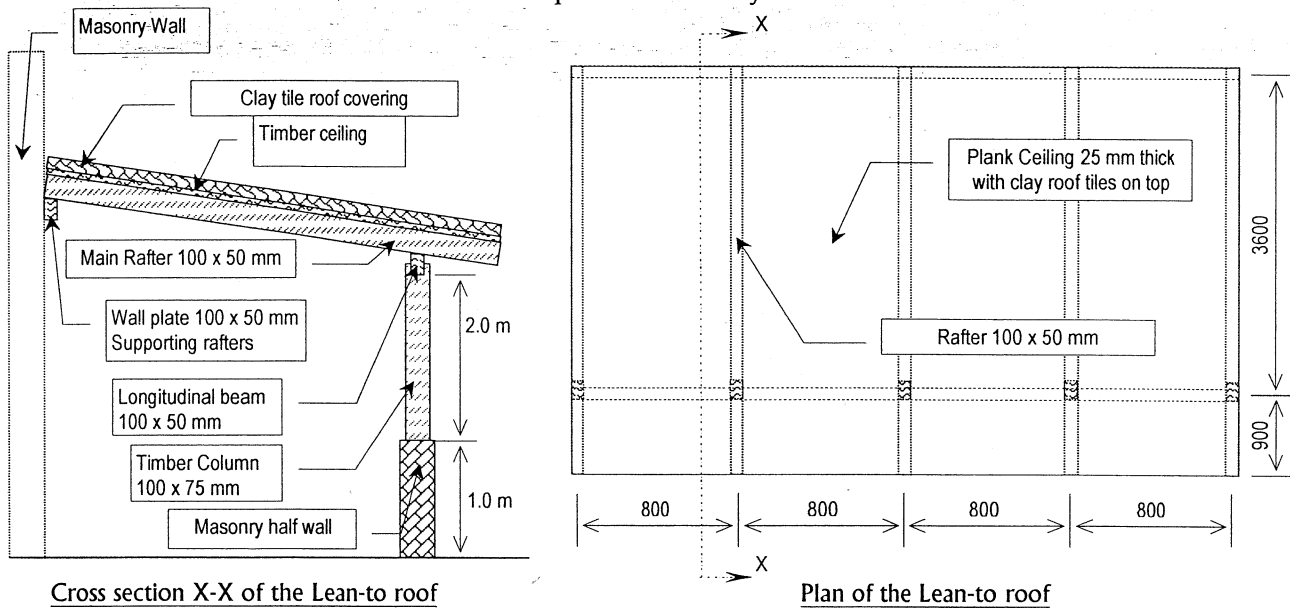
Plan & a Cross Section of the Lean-to Roof
